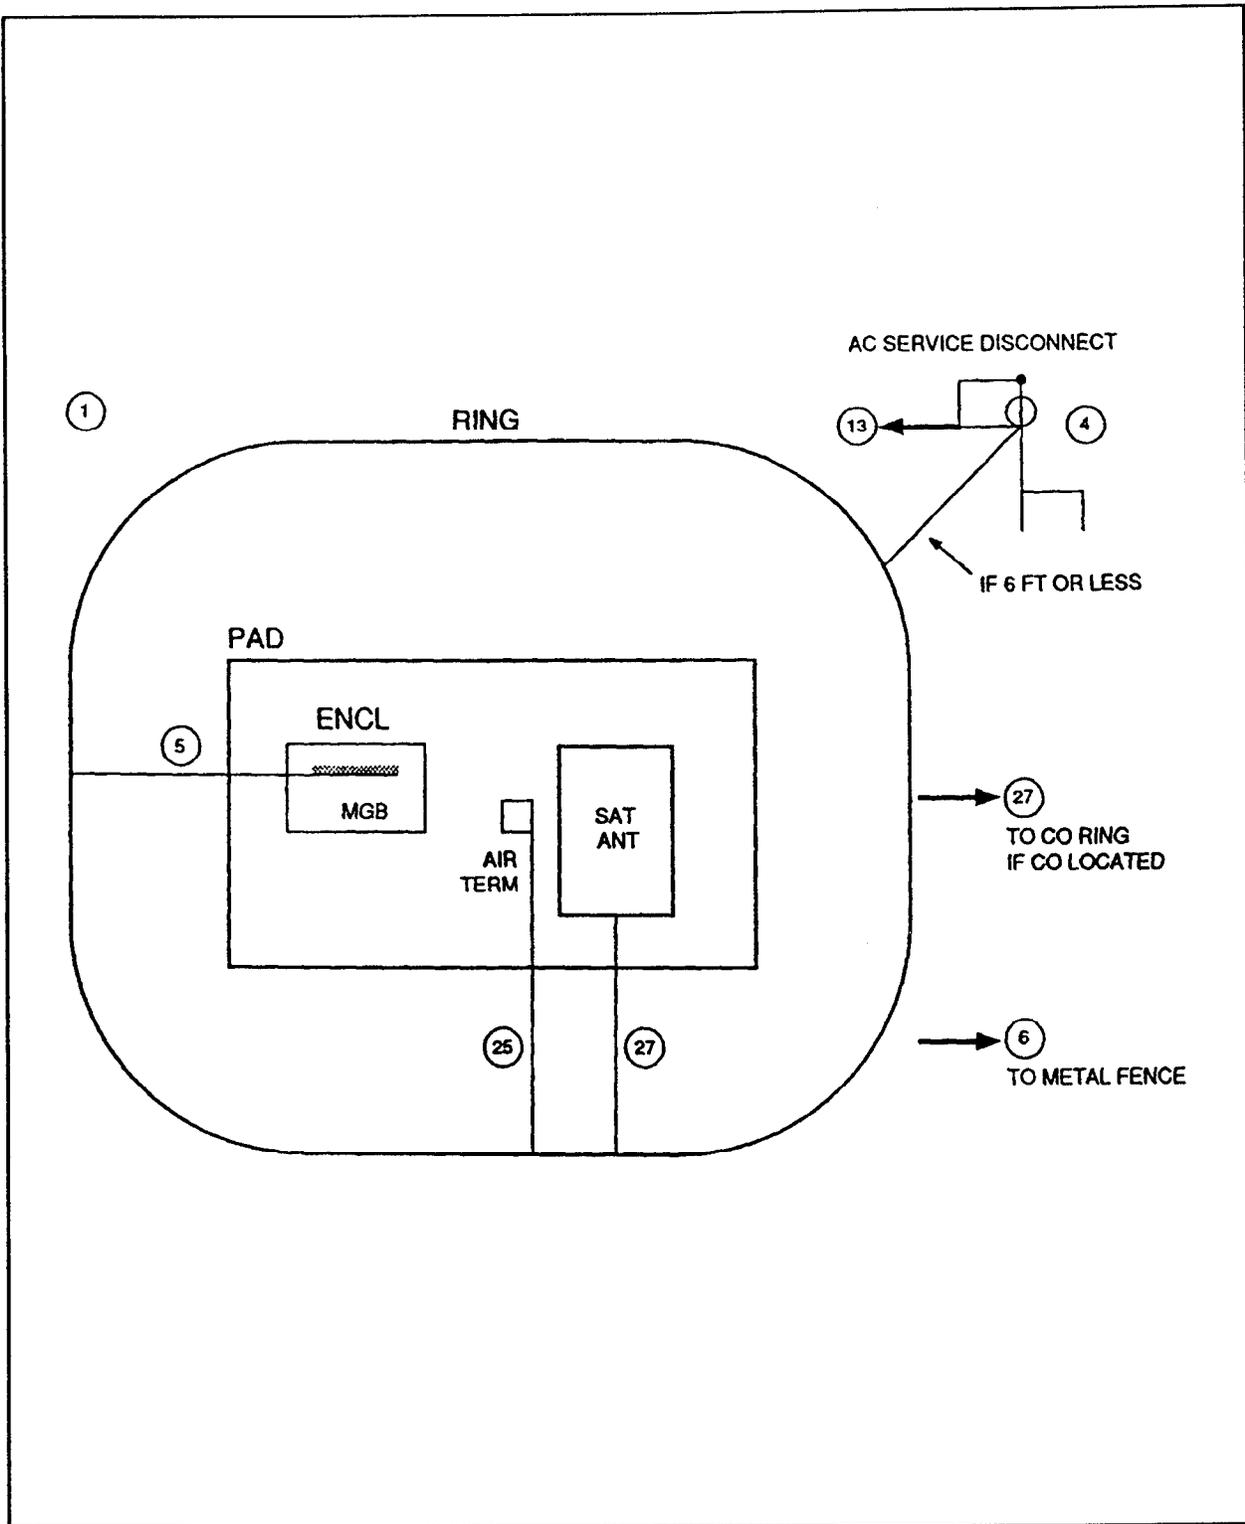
Typical Grounding for a Pad-Mounted Earth Station
